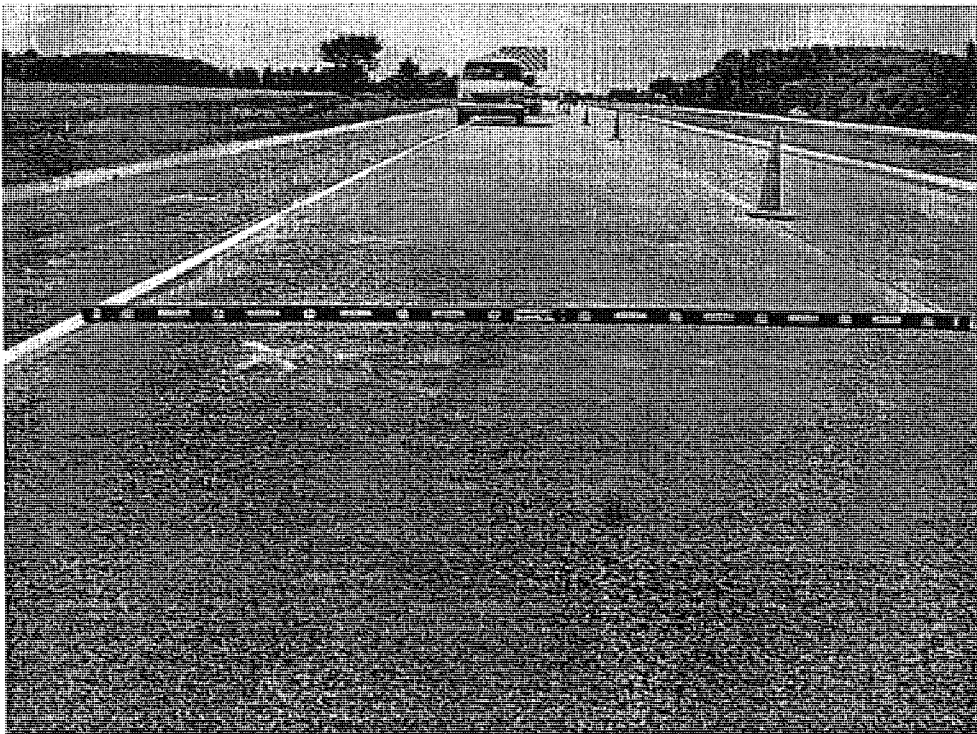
No measurable rut on US-27 SB section 3 test site 1
